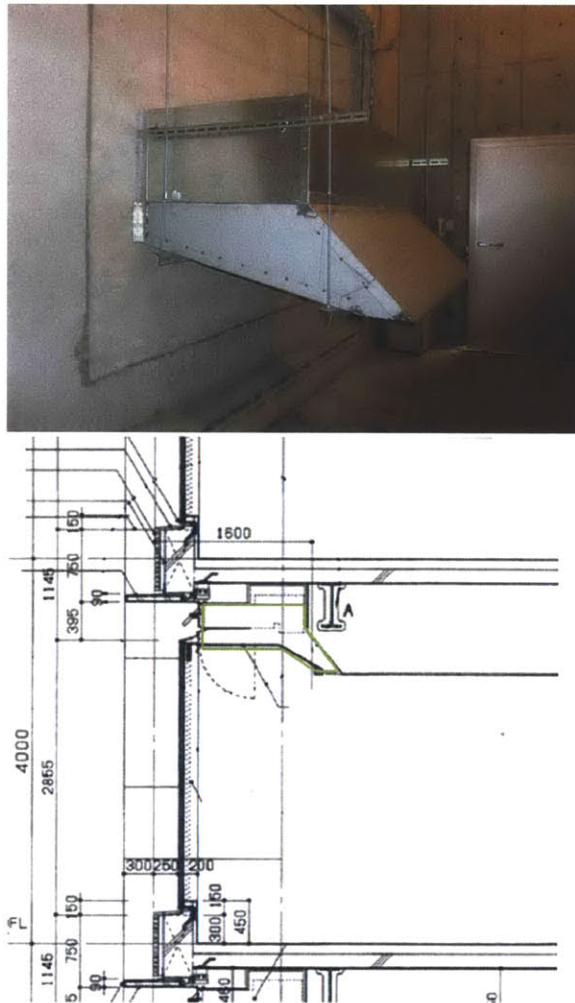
Section of inlet assembly modeled with full scale modeling techniques and full scale replication of the assembly [47].
